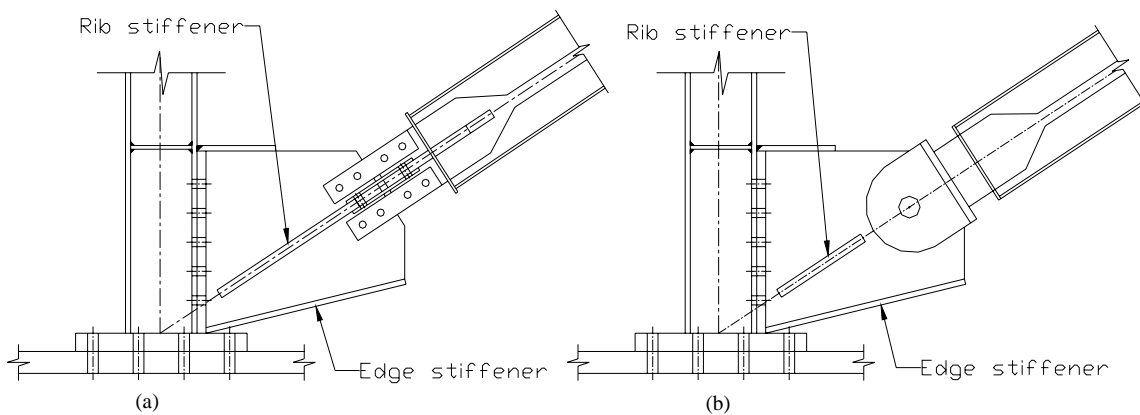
Typical Gusset-Plates Details: (a) Nippon Steel BRBs; (b) Star Seismic BRBs
